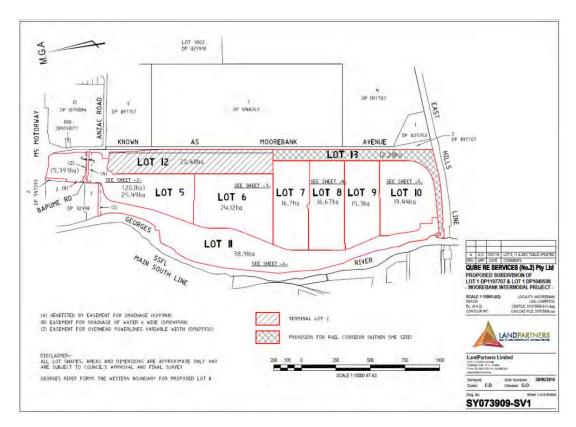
Proposed Subdivision Plan MPW Stage 3
